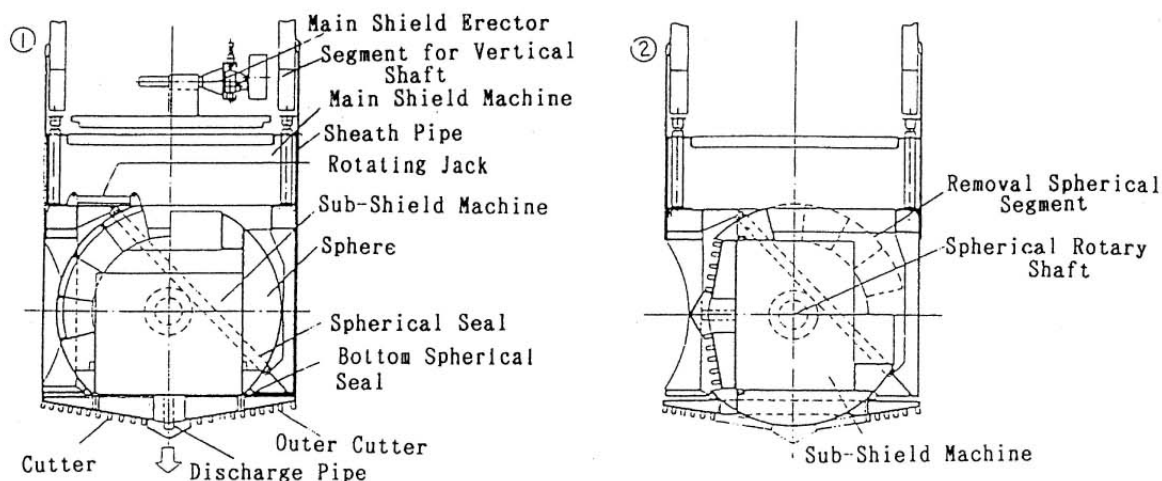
Outline drawing of vertical-horizontal continuous shield machine
